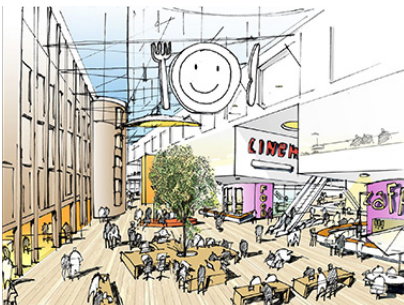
and Figure 2 In this project I to analysed a big building and made an intervention in this building. I found a space between the old and the new building that on plan and section looked as a qualitative space (in figure 1 the impression sketch made by the architects from OMA). But after modelling the space, it turned out that the space actually was left over space (in figure 2 the space seen by me). Redesigning this space and giving this space a function was the starting point of my intervention.
